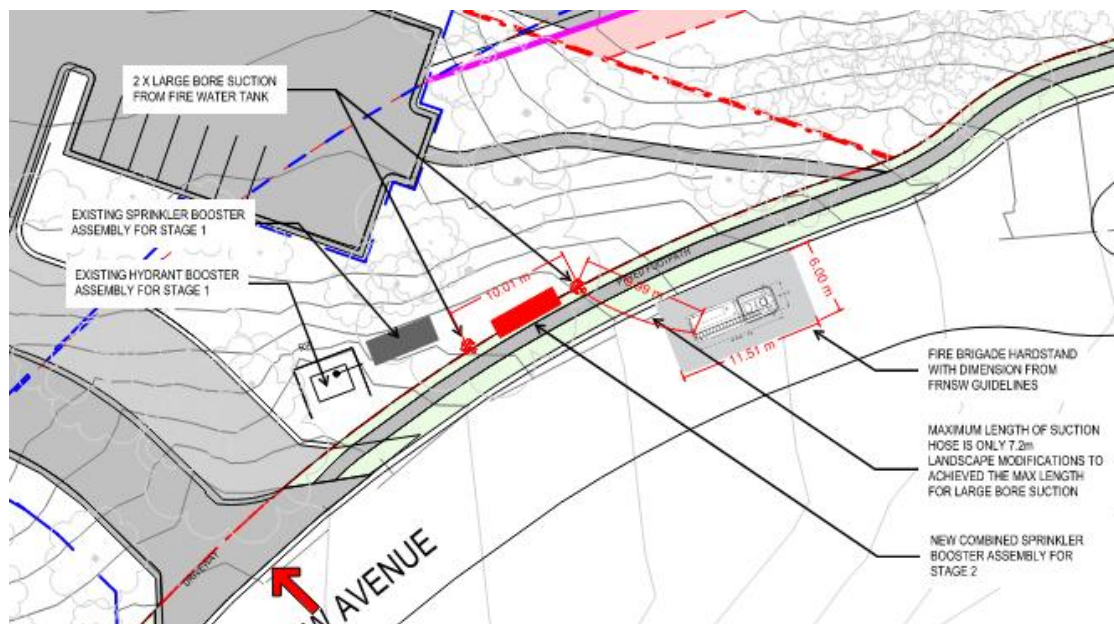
Floor Plan Showing Booster Assembly and Hardstand Requirements
